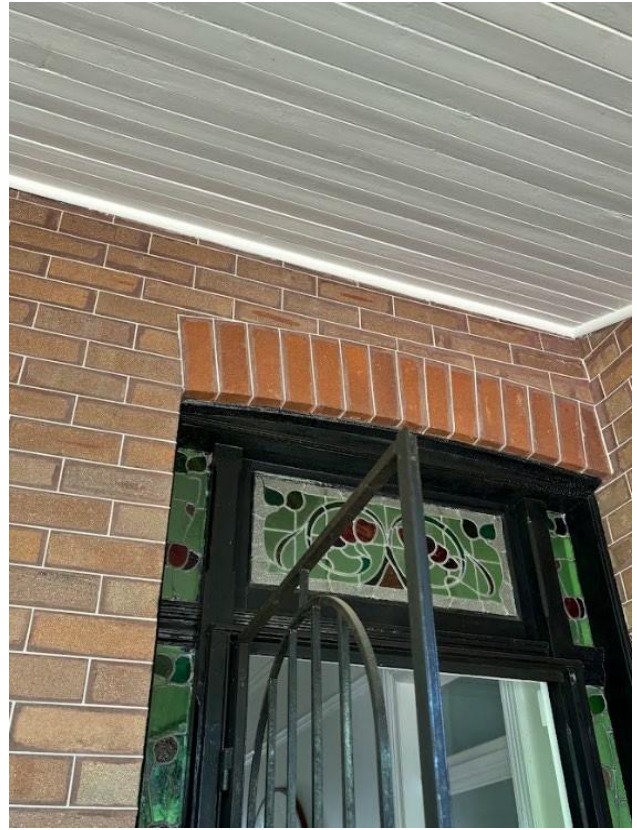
Repointed curved brick lintel above entryway with new lead-light front door below
